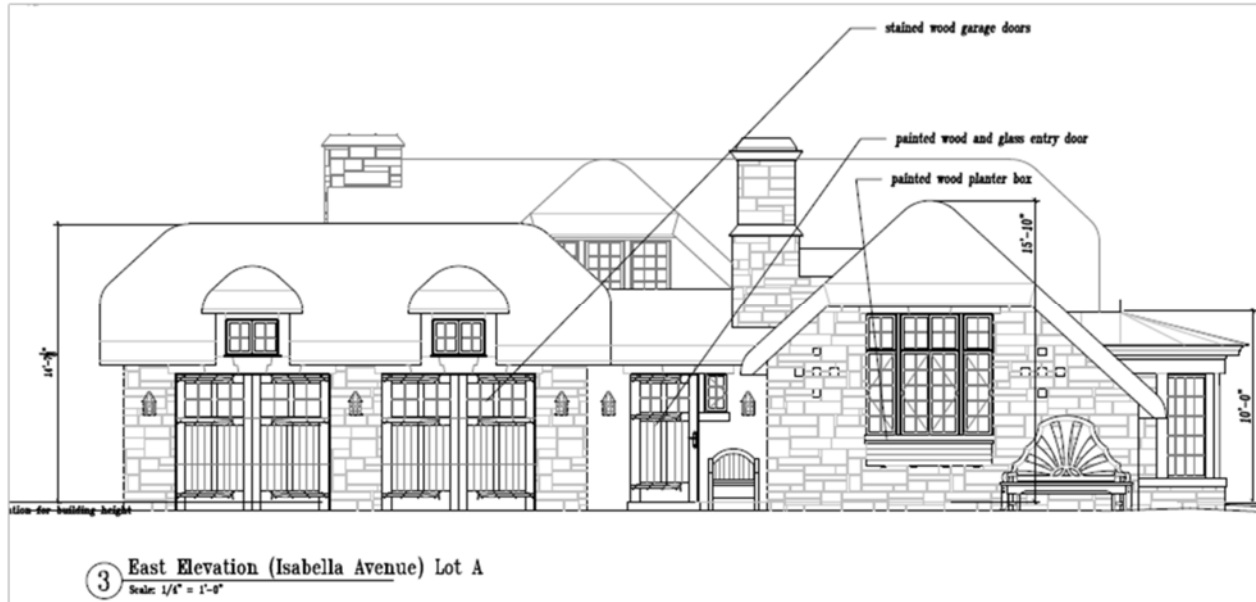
Proposed Architectural Style as Viewed from Isabella Avenue, Lot A
